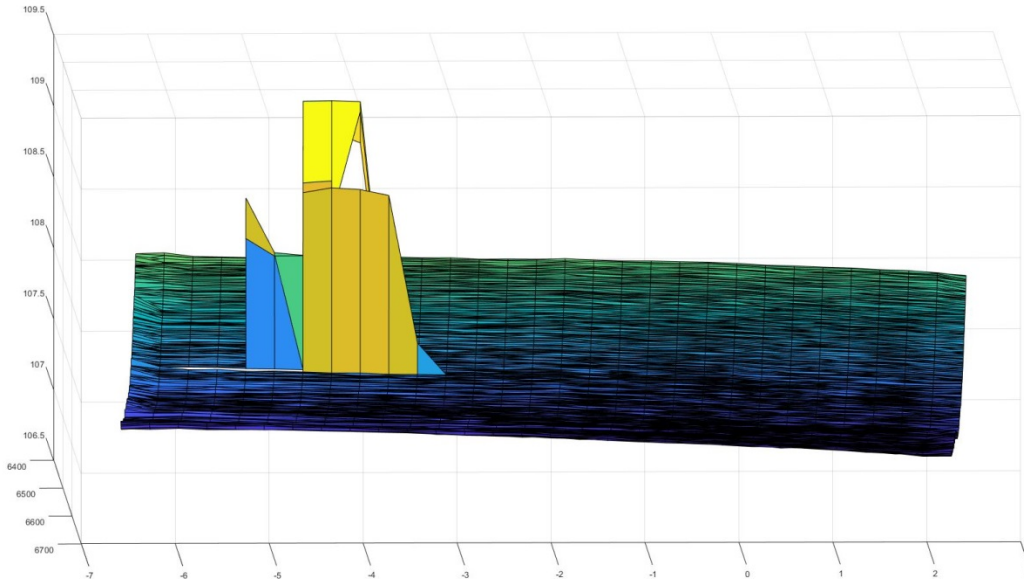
Proof of Concept Code Digital Rendering of Section 41 on FM 2625 Cross-Section.
